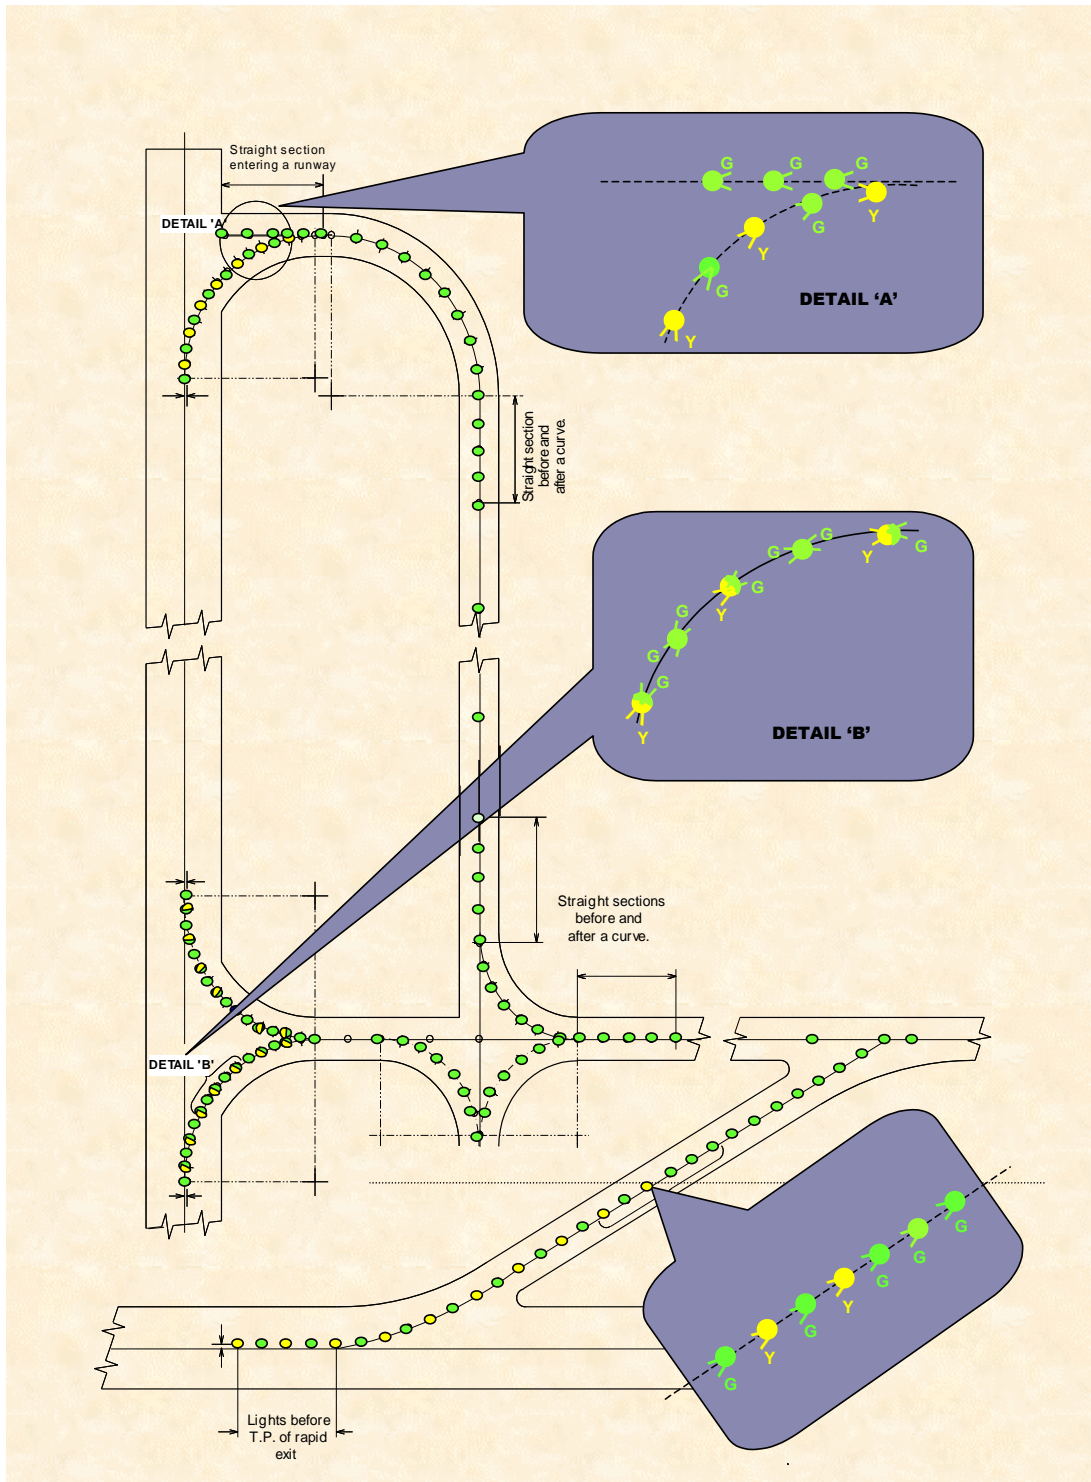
(a): Typical Taxiway Centreline Lights Layout
